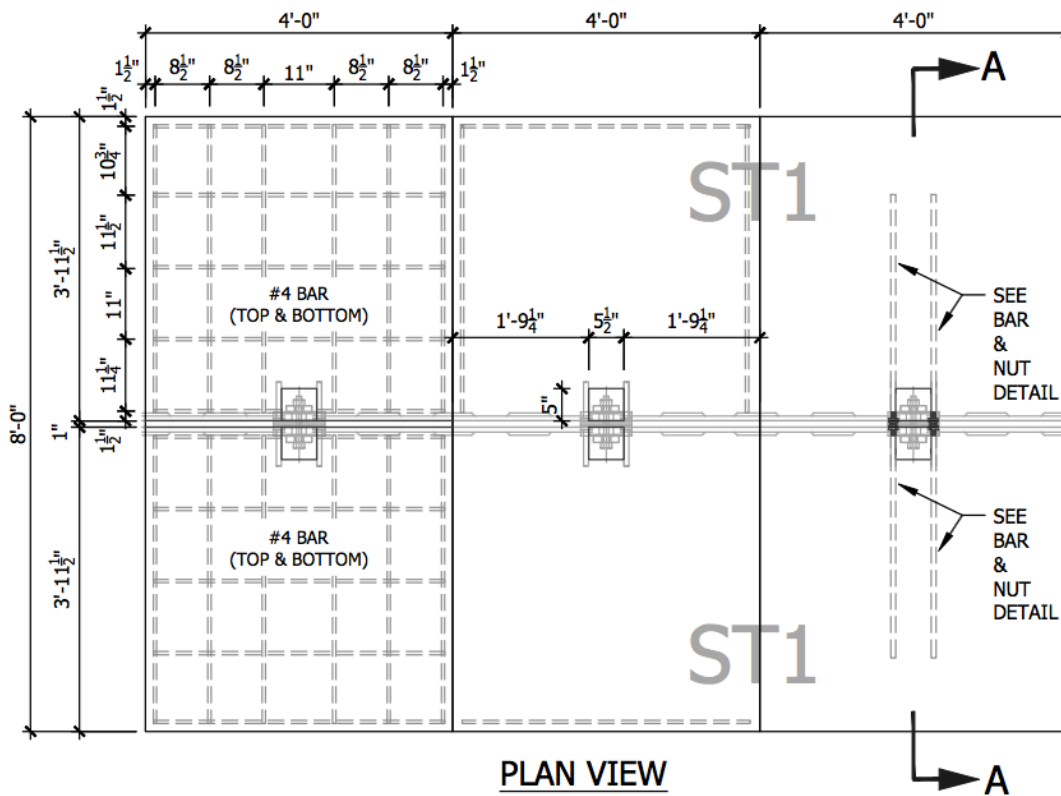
Mechanical Connection Details for Precast Adjacent Beam Bridges
